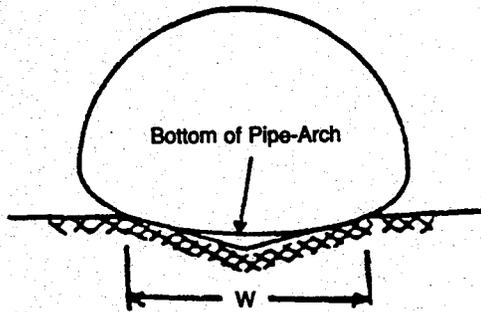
"V" Shaped Bed (Foundation) for Larger Pipe Arch, Horizontal Ellipse and Underpass Structures
